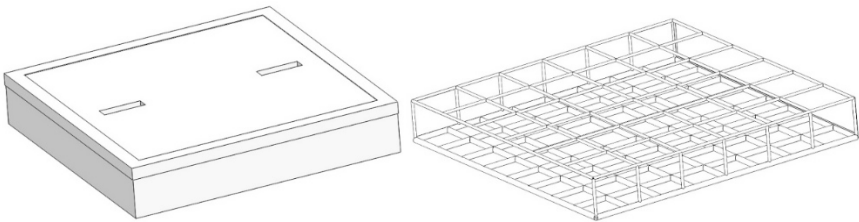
Schematic diagram of the structure of the concrete slab in the oil pipe trench.
